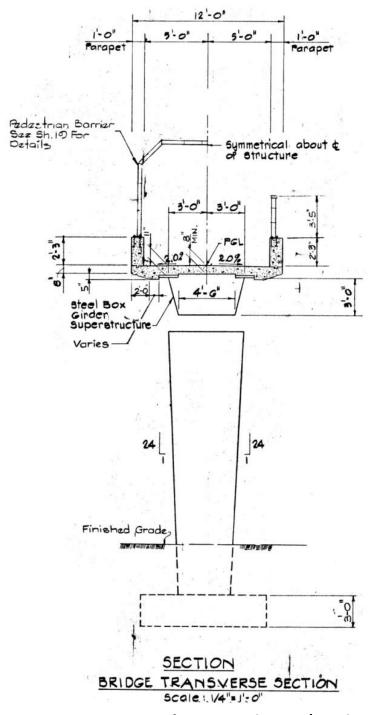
Transverse Section of Existing Pedestrian/Bicycle Bridge
